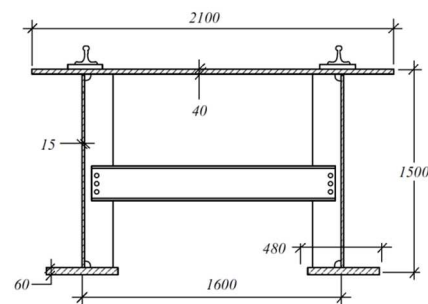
Cross-section of the considered railway bridge, acc. to [6]
